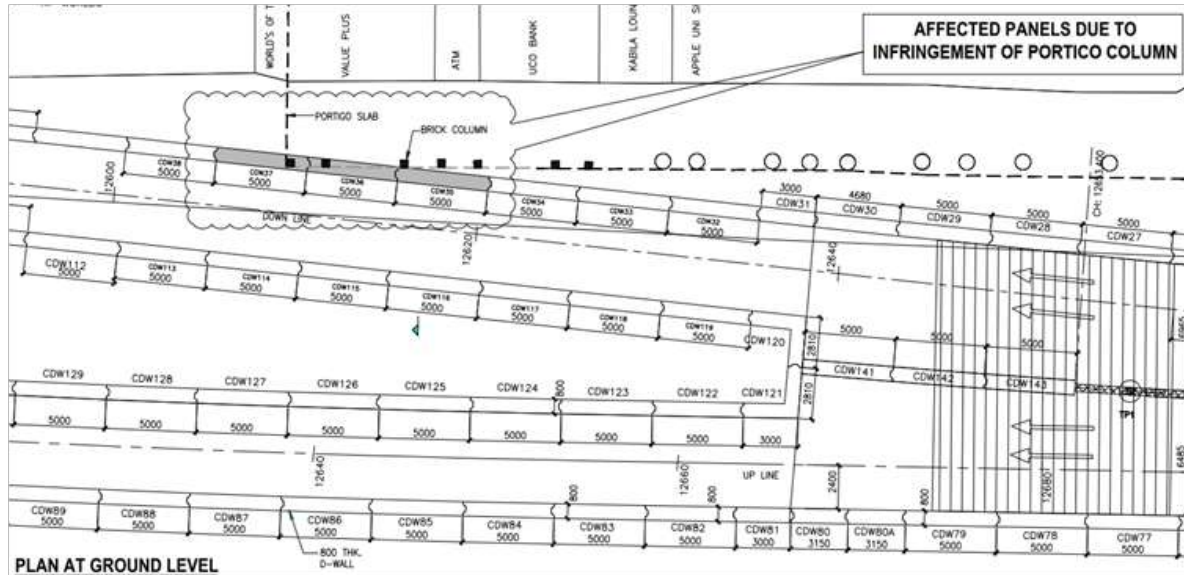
Plan showing cut & cover Box Tunnel (Diaphragm Wall Panels) affected due to infringement of column and foundation of existing portico of a building
